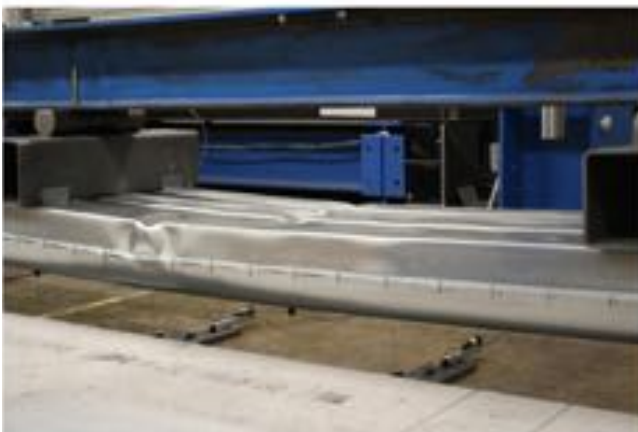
Substantial mechanisms in top deck and Initial buckling and yielding in the bottom deck of a bare steel deck specimen
